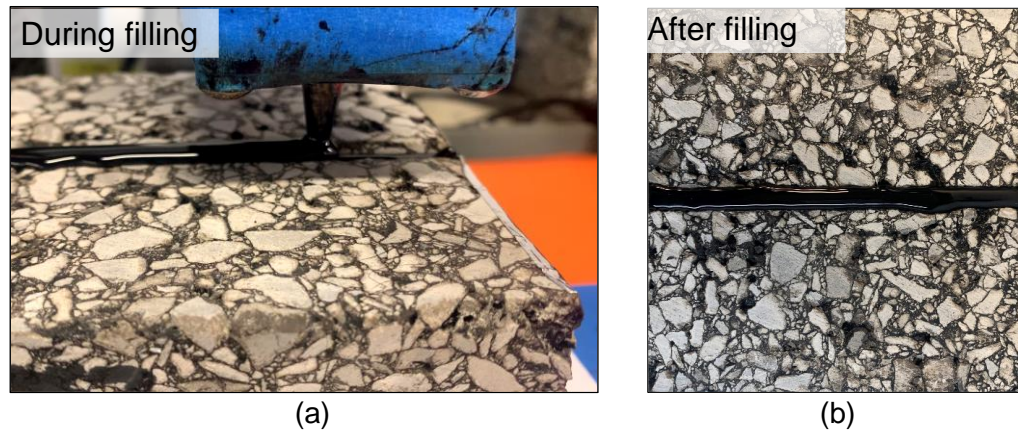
(a) 3D printing in progress to fill a regular crack³⁴ and (b) the filled crack.
